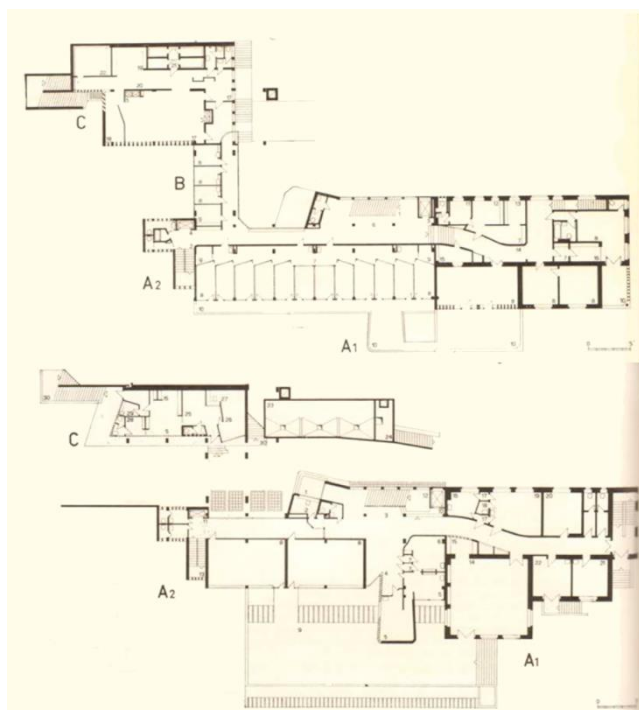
Basefloor and first floor of the Children's department of the Institute (source: Babić Lj.
